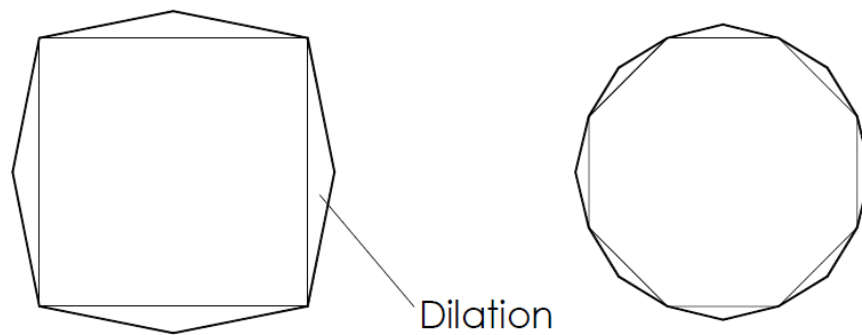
Idealized Dilation of Square and Octagonal Cross-sectioned Columns
